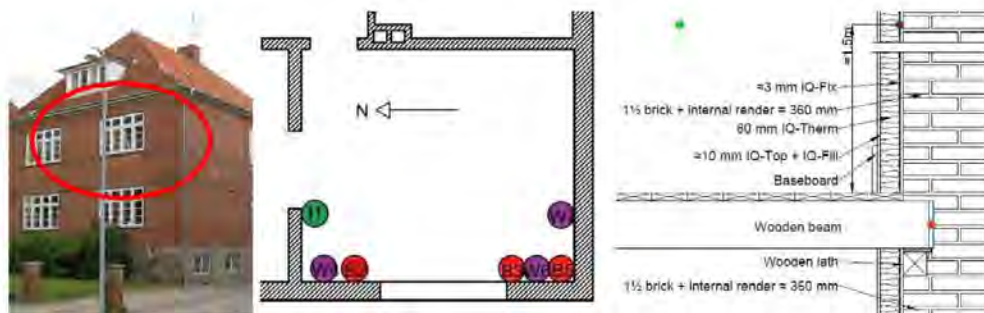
Left to right: Ny Allegade facade with indication of insulated walls, sensor placement on floor plan, and construction with sensor placement.
